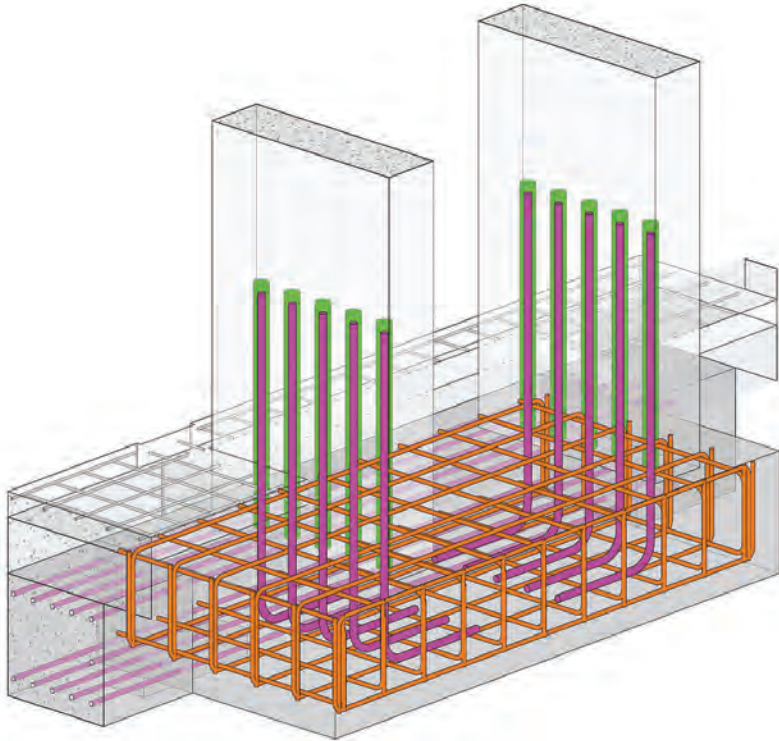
Detail of a BIM model describing precast concrete connections and reinforcing.
